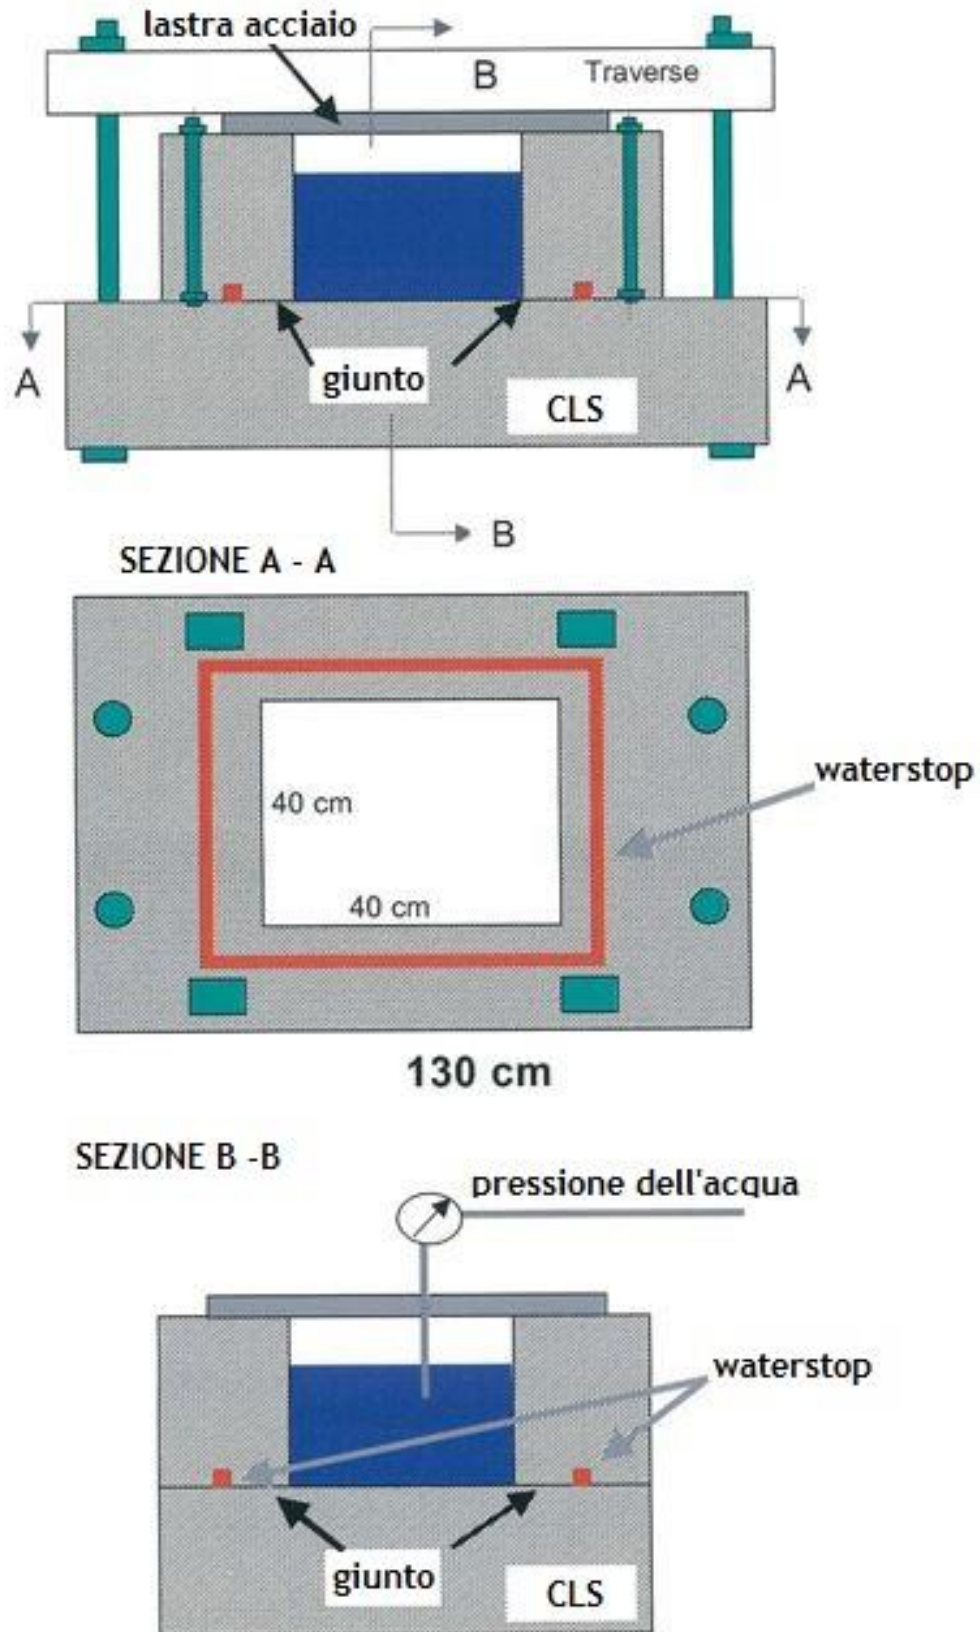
Test installation, leak test (construction joint sealing with swelling tapes); sketch
